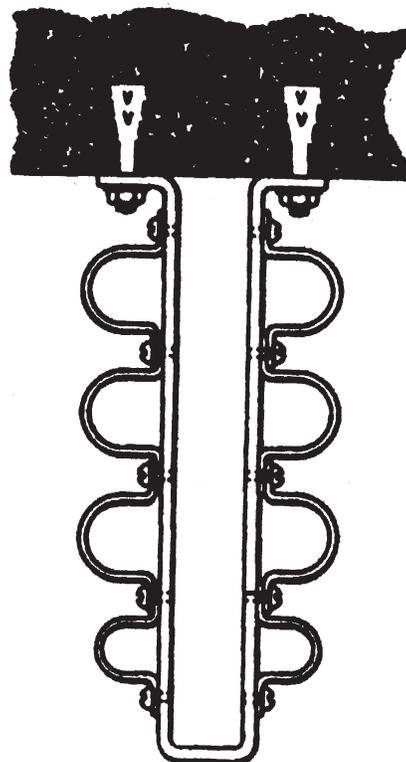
A U-SECTION FASTENED TO A CONCRETE CEILING WITH RAG-BOLTS USED TO CARRY A NUMBER OF SADDLES OF THE REQUIRED SIZE
